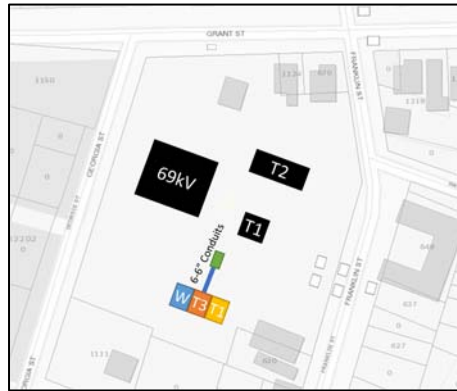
Georgia St New Switchgear to Future T3 Conduit Route
